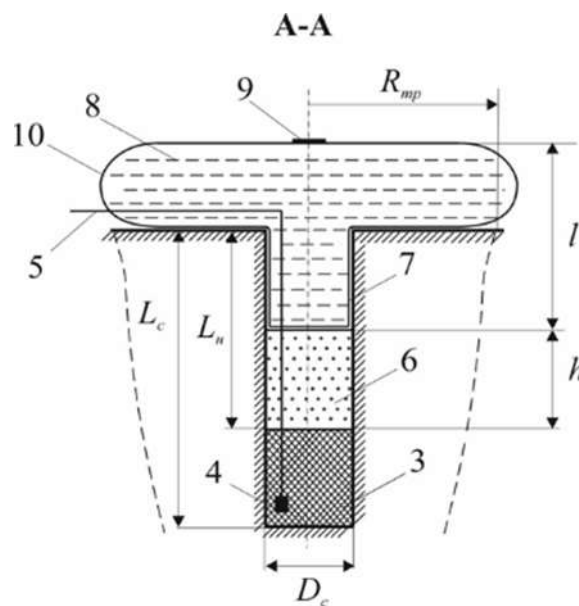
A-A section of the blast wellhead. 3 – explosive charge; 4 – initiator of the explosive charge; 5 – waveguide of the initiation system; 6 – stemming that is made of crushed stone; 7 – hermetic hose; 8 – hydrogel; 9 – check valve; 10 – mushroom-shaped protective layer; D_c – borehole diameter, m; L_c – length of the well, m; L_H – the length of the inactive part of the well, m; l – length of the sealed sleeve, m; h – the height of the crushed stone pack, m
